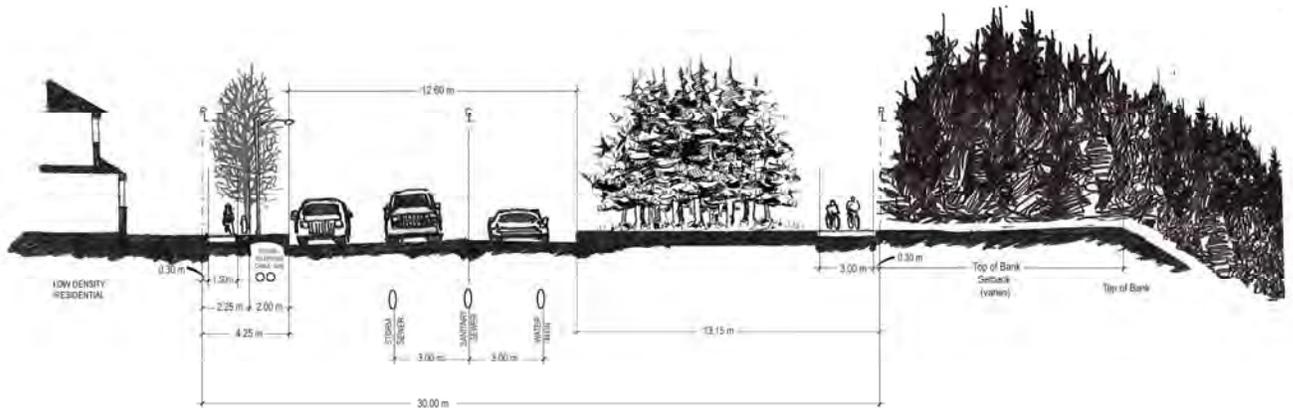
Cross section of Firebreak Road; showing pathway in wooded area
